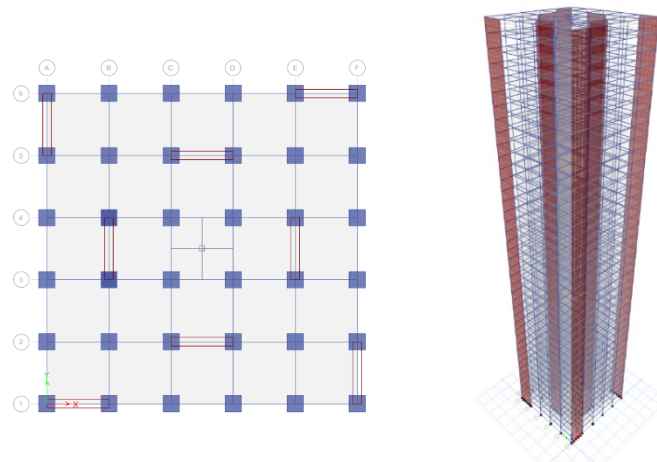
Structure with square reinforced concrete frames – plane and elevation
